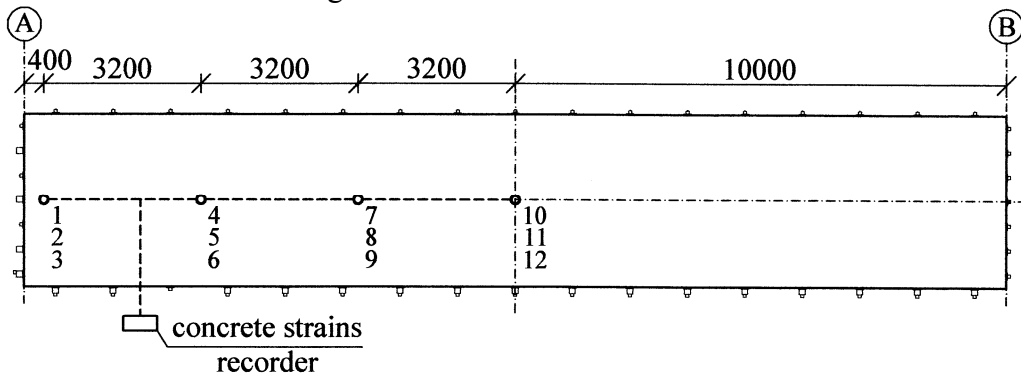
Concrete strain transducers arrangement at the height of prestressed concrete slab.
